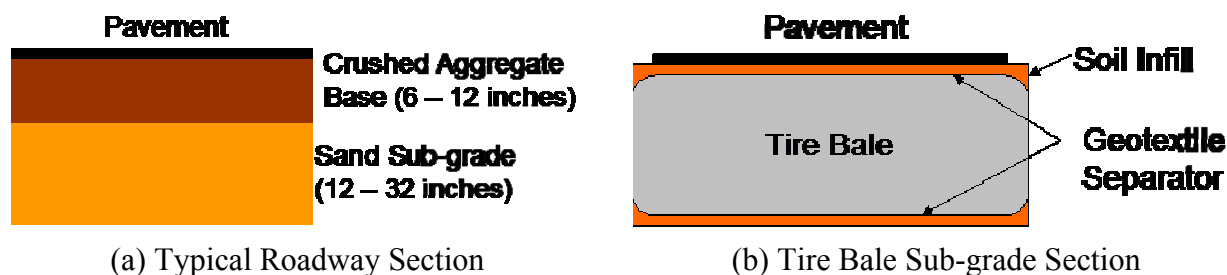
Illustrations of the Typical Roadway Cross Section and the Tire Bale Subgrade Cross Section
